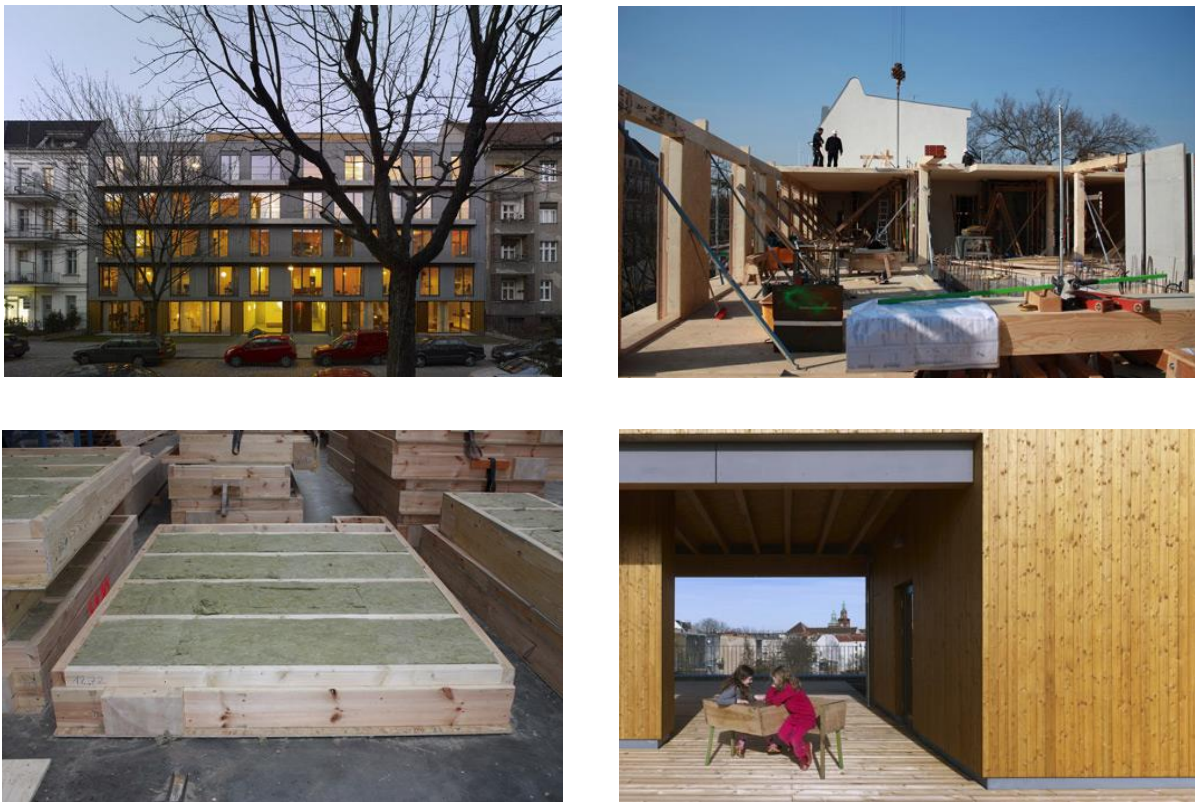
Timber construction and prefabricated wall assembly in the 3xGrün Baugruppe.
